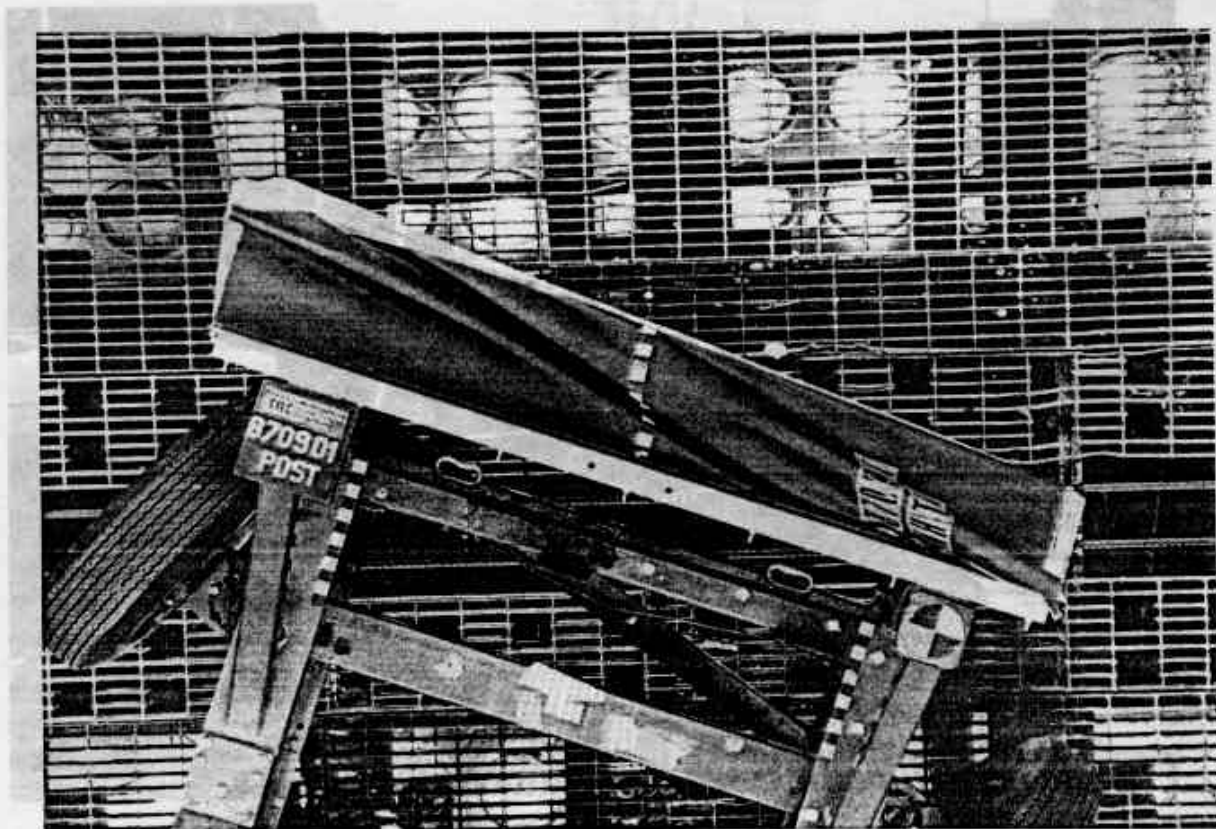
POST-TEST OVERHEAD - VIEW 1
